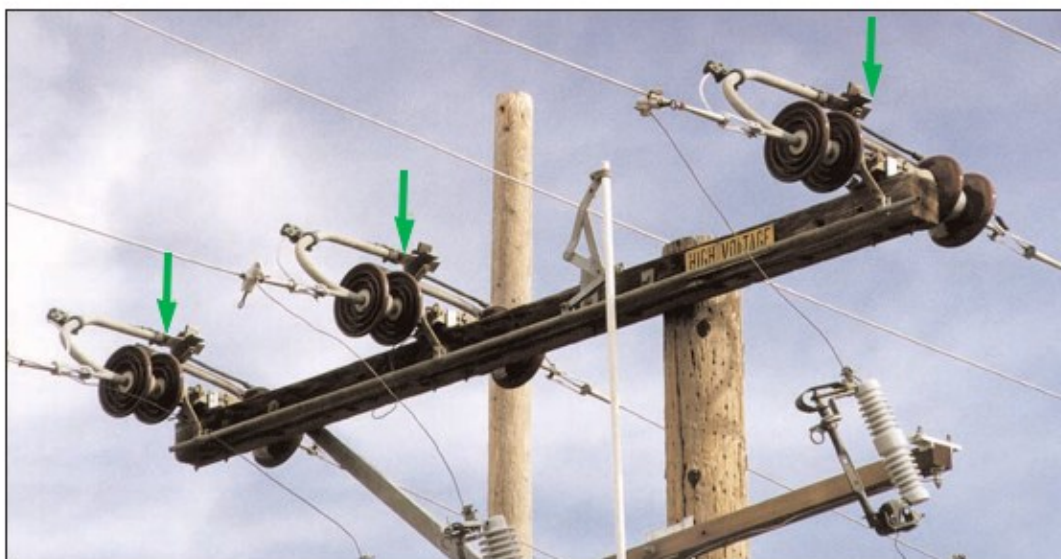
600 Amp KPF Air Switch, Crossarm Construction (Closed Position) without Arcing Horns or Snuffers
